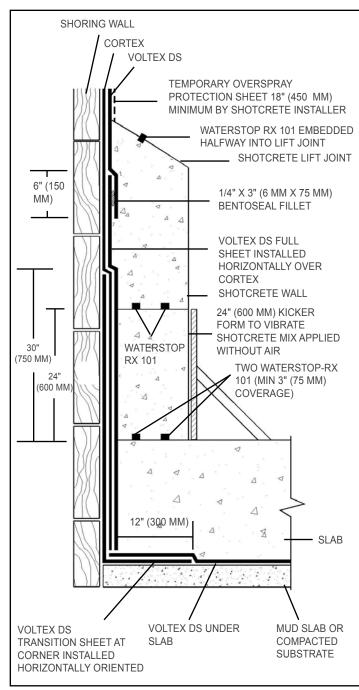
SHOTCRETE WALL WITH KICKER FORM Install base Voltex DS sheet horizontally oriented onto shoring wall over Cortex and extend the underslab Voltex DS sheet to the slab/wall corner overlapping the Voltex DS transition sheet a minimum 12" (300 mm).
